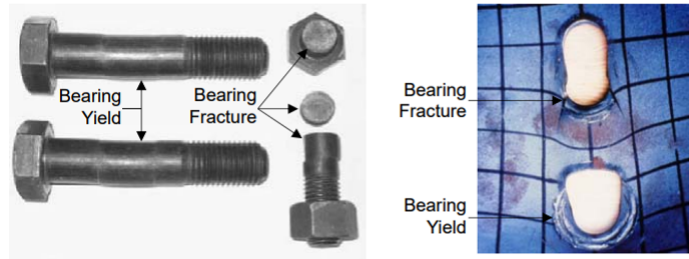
Bolted Joint Failure Modes [30]
